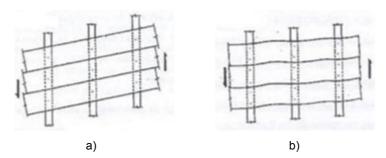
Possible deformation of the timber pavements (Carvalho and Oliveira, 1997); a) Timber boards and pavement beams connected by one nail; b) Timber boards and pavement beams connected by two nails
